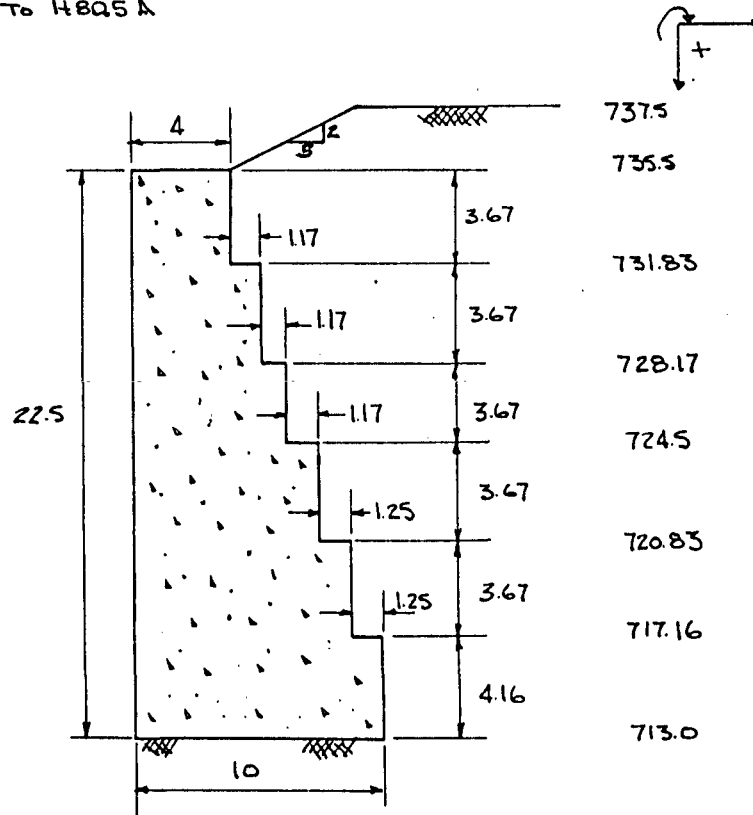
LAND WALL - UPPER GUIDE WALL L-18
